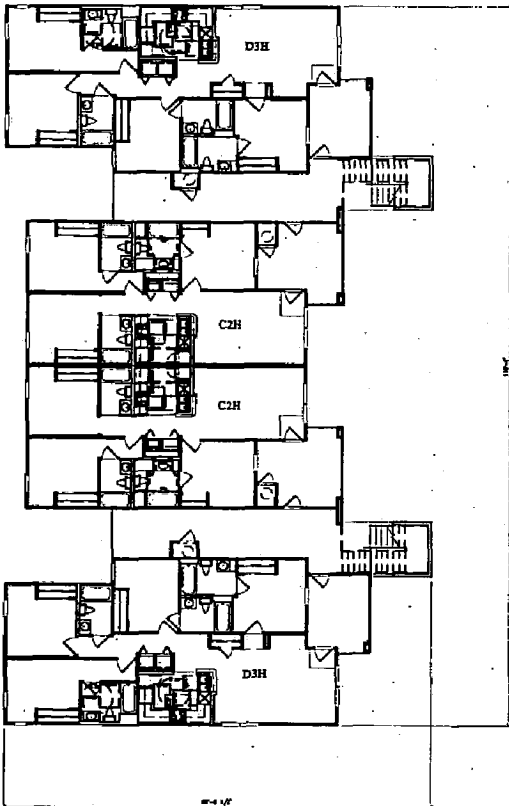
Y - Building Type XI - First and Second Floor Plans
